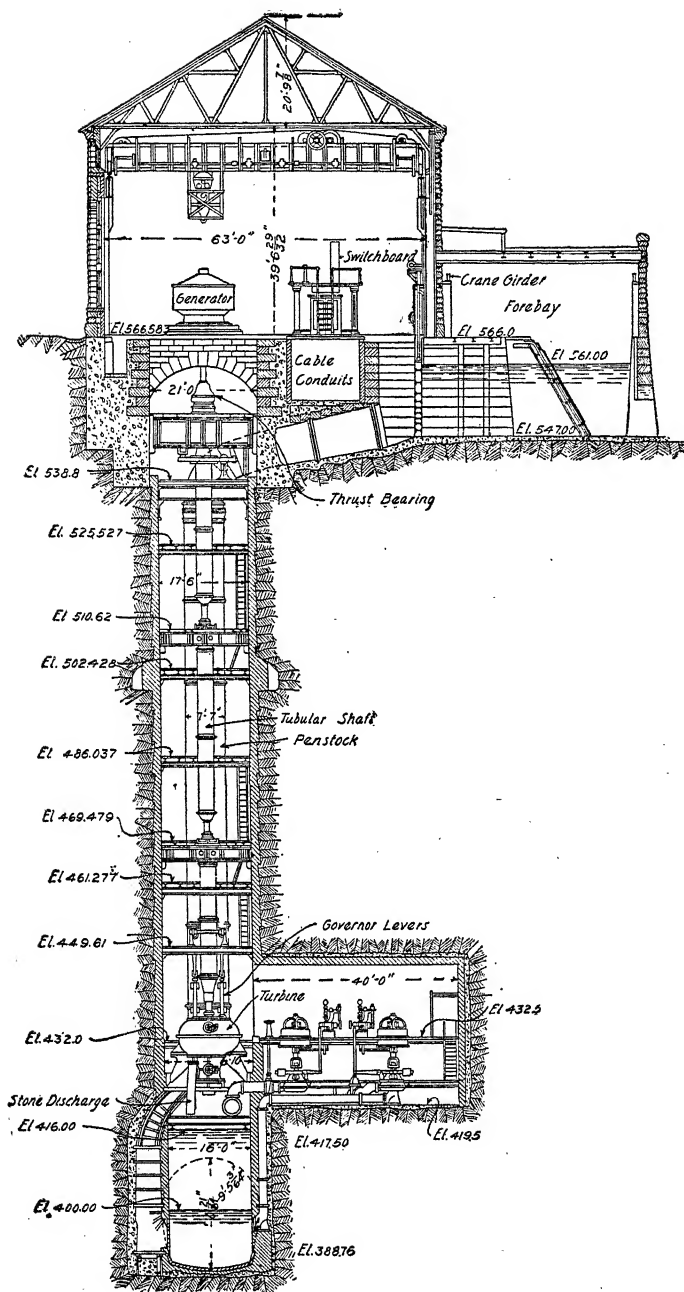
Cross-Section of Power House No. 2 and Wheel Pit,
